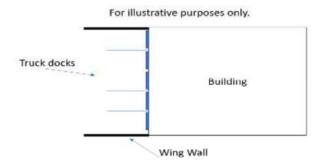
EXHIBIT C – FILE NO. Z0822-0253 - CONCEPT PLAN
